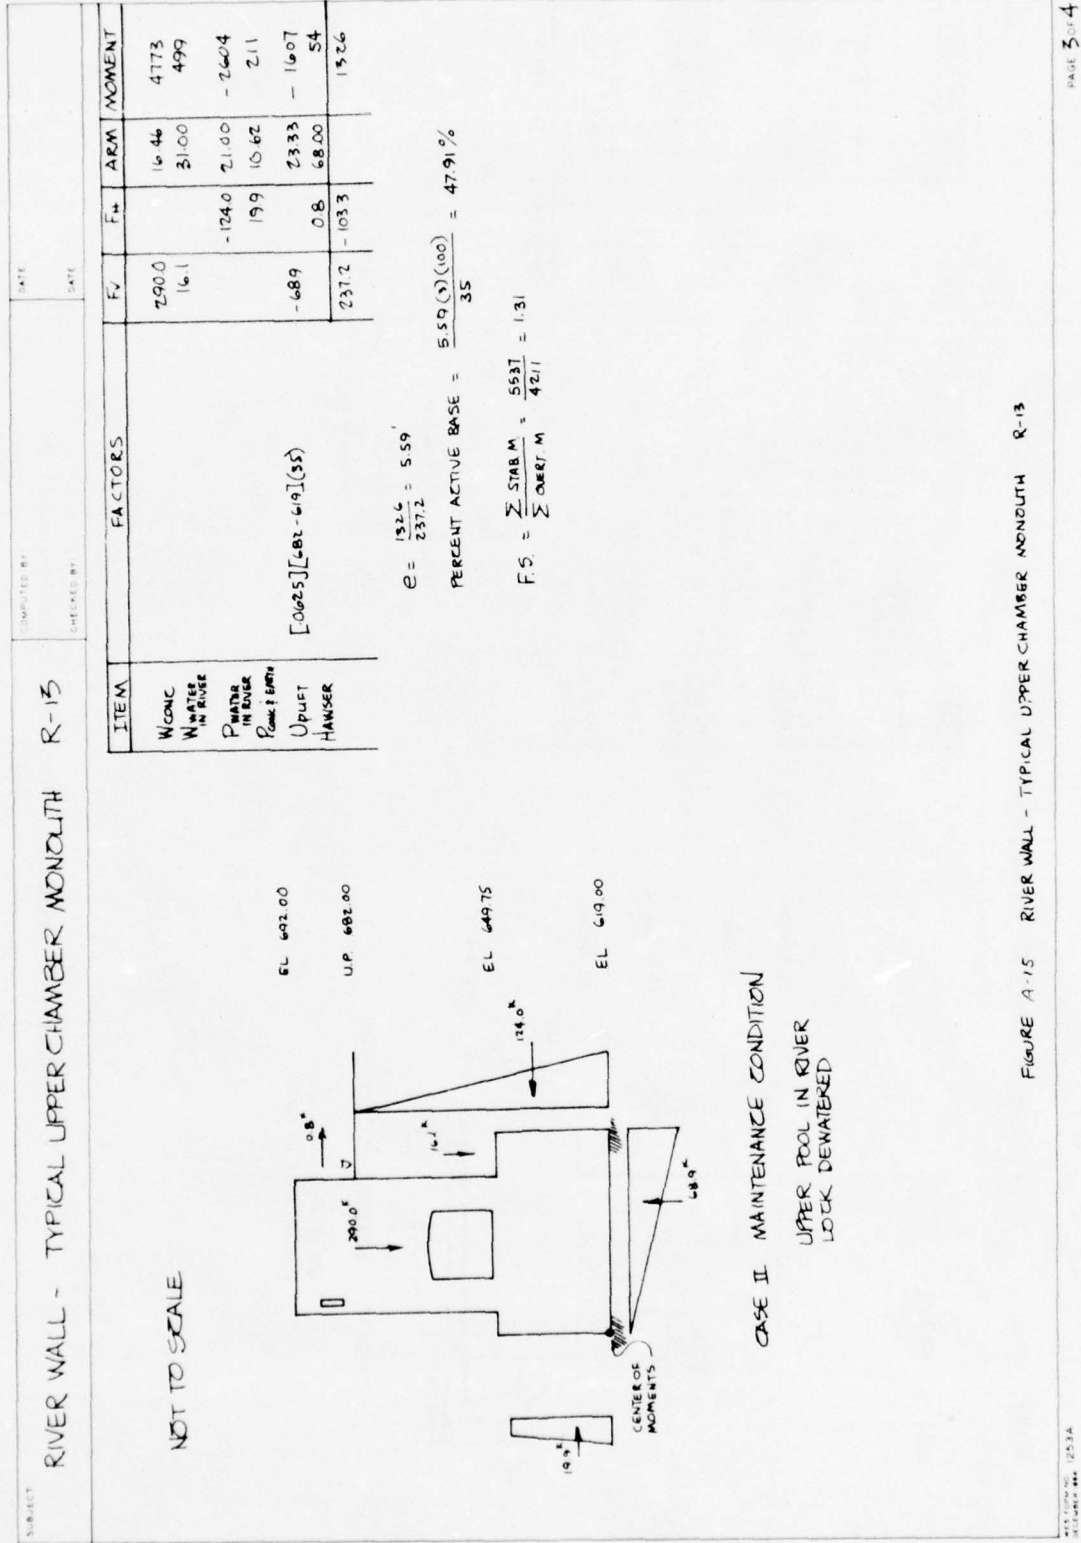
RIVER WALL - TYPICAL UPPER CHAMBER MONOLITH R-13
